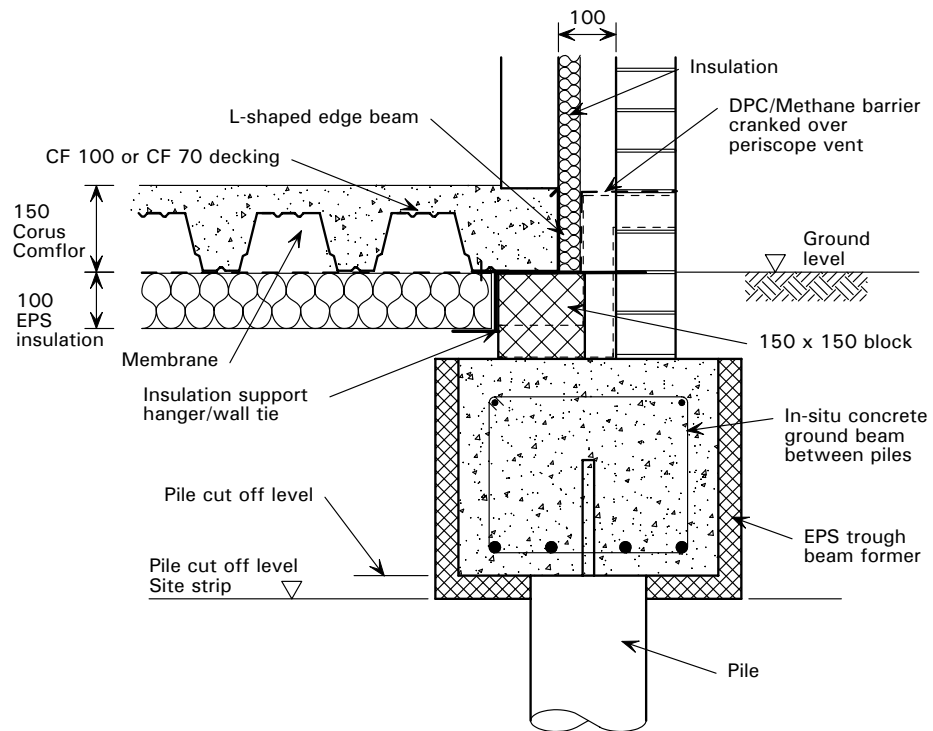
In-situ concrete ground beam on piles with composite ground floor and L-shaped edge beam on 'greenfield' site.
